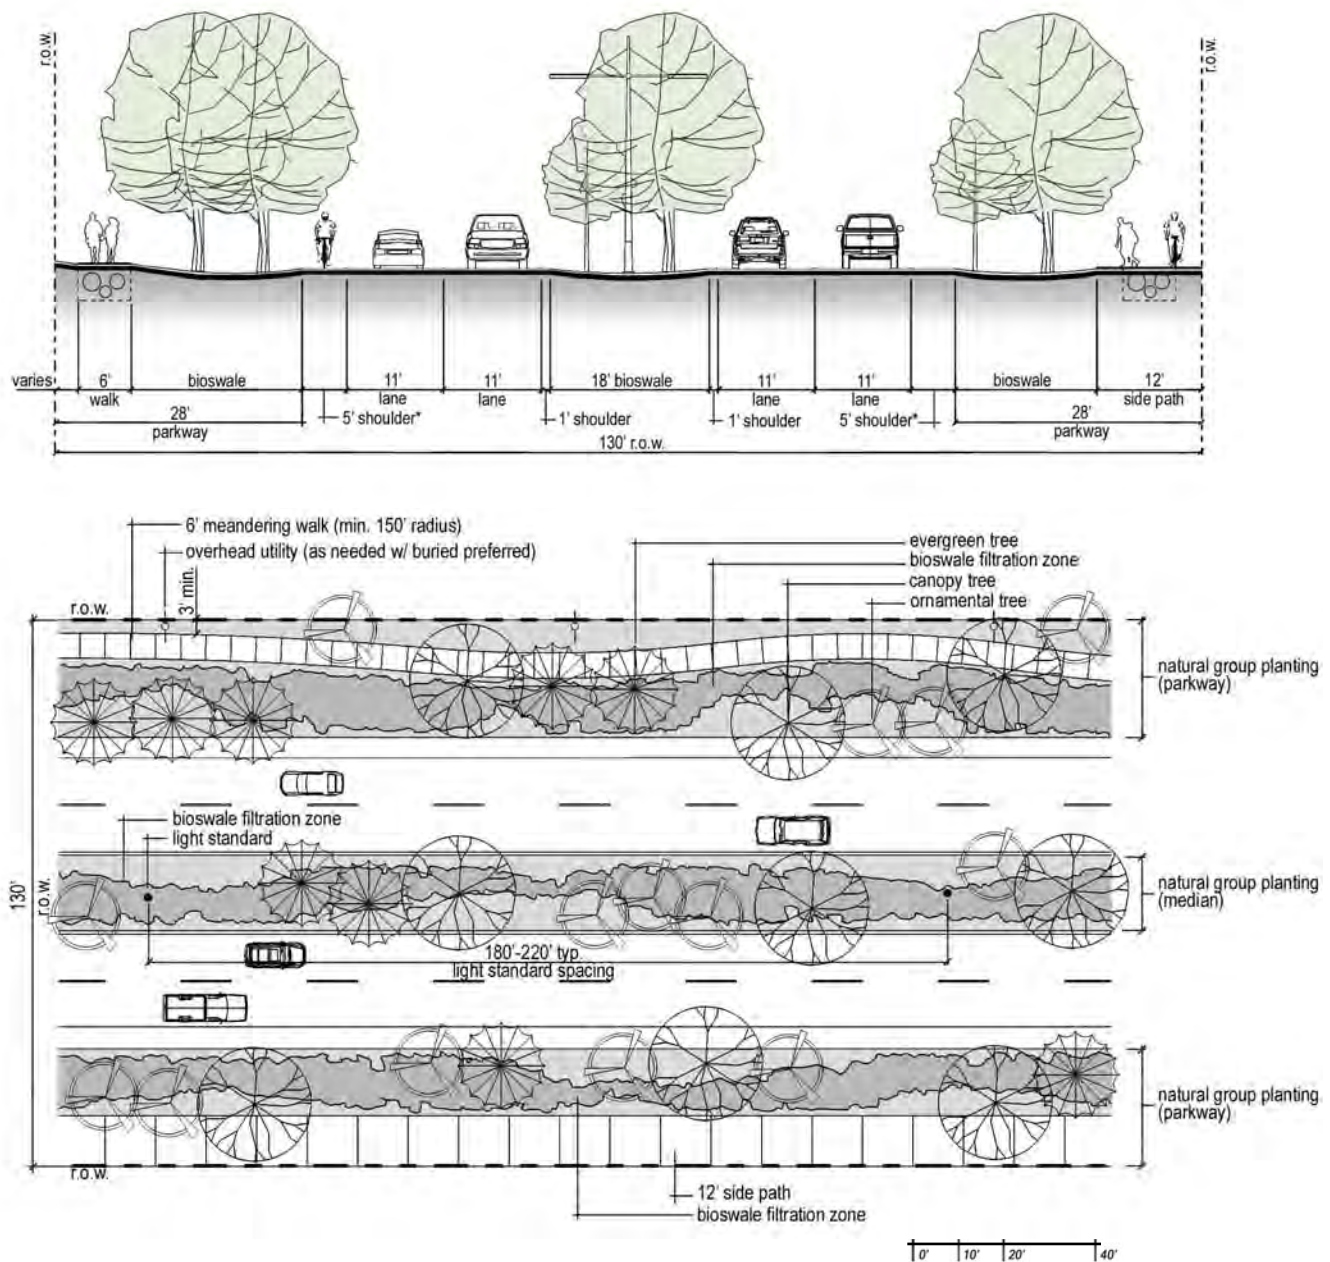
Typical Greenway Arterial Section & Plan: Rural Arterial
